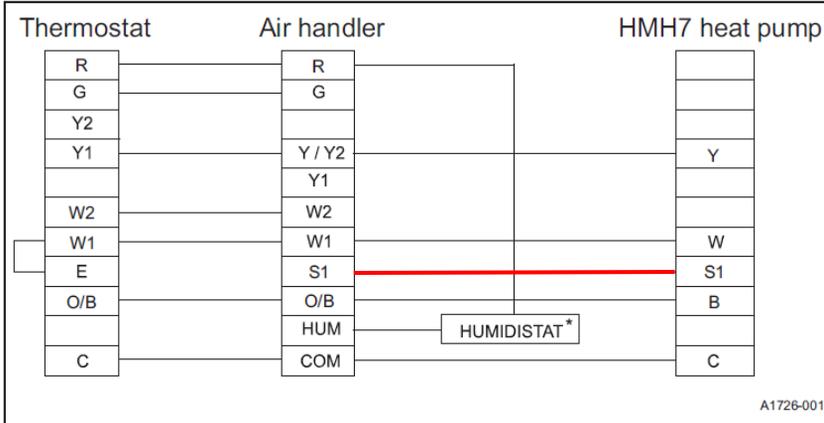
Control wiring - premium ECM blower and HMH7 heat pump - conventional wiring
